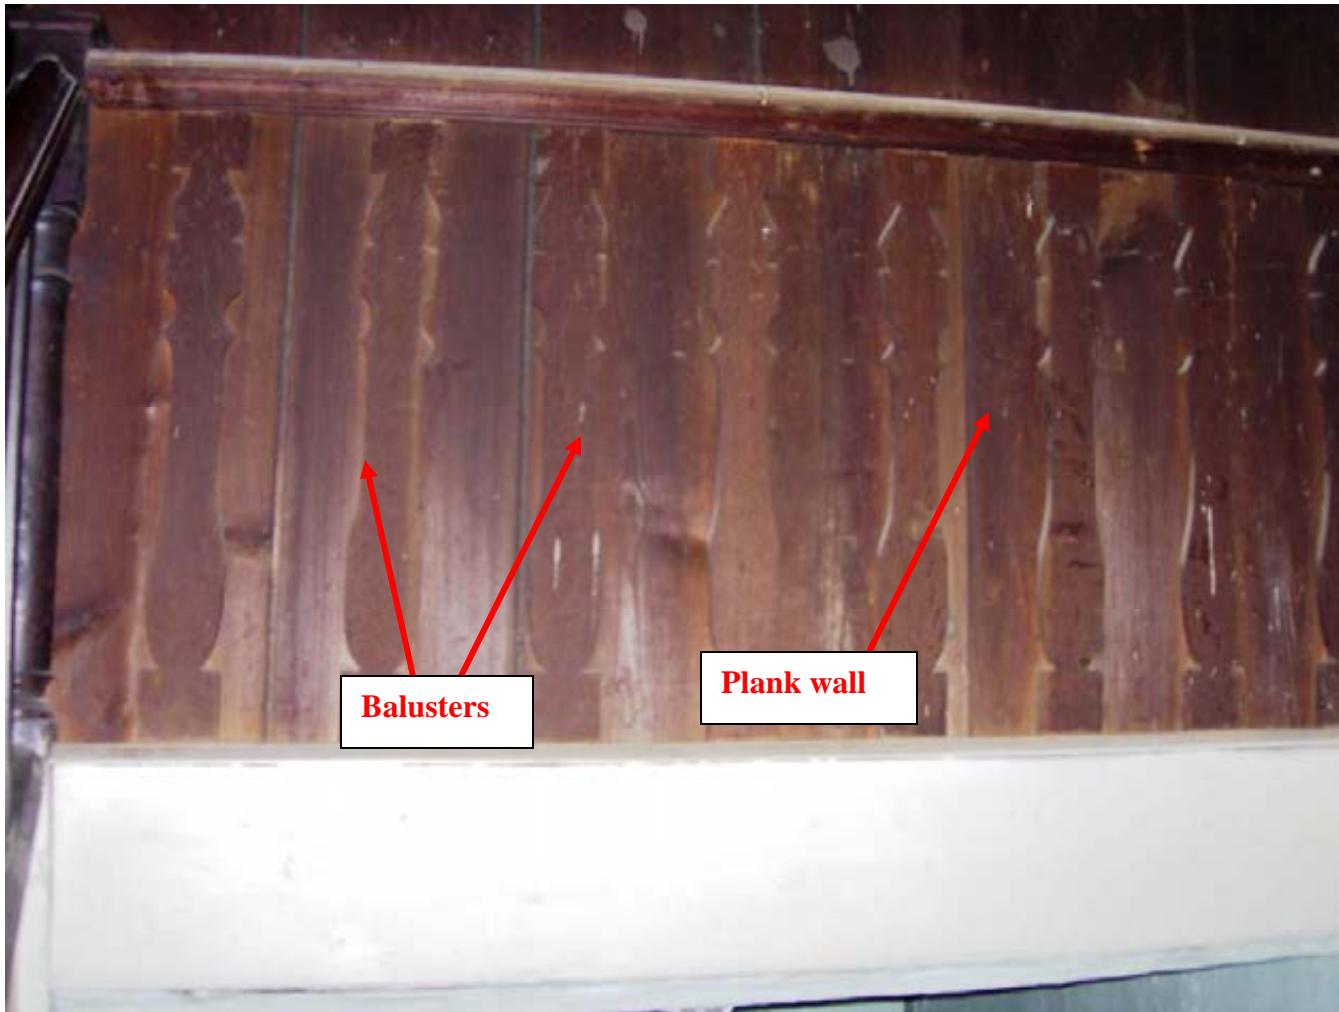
Plank wall built behind balusters in the attic's central bay. This view is from the stairs below. Photograph by Kathleen Manicke.
